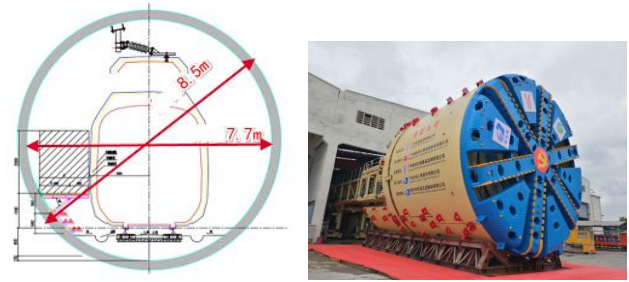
Shield tunnel cross-section dimensions and shield machine photos of ChenXi section
